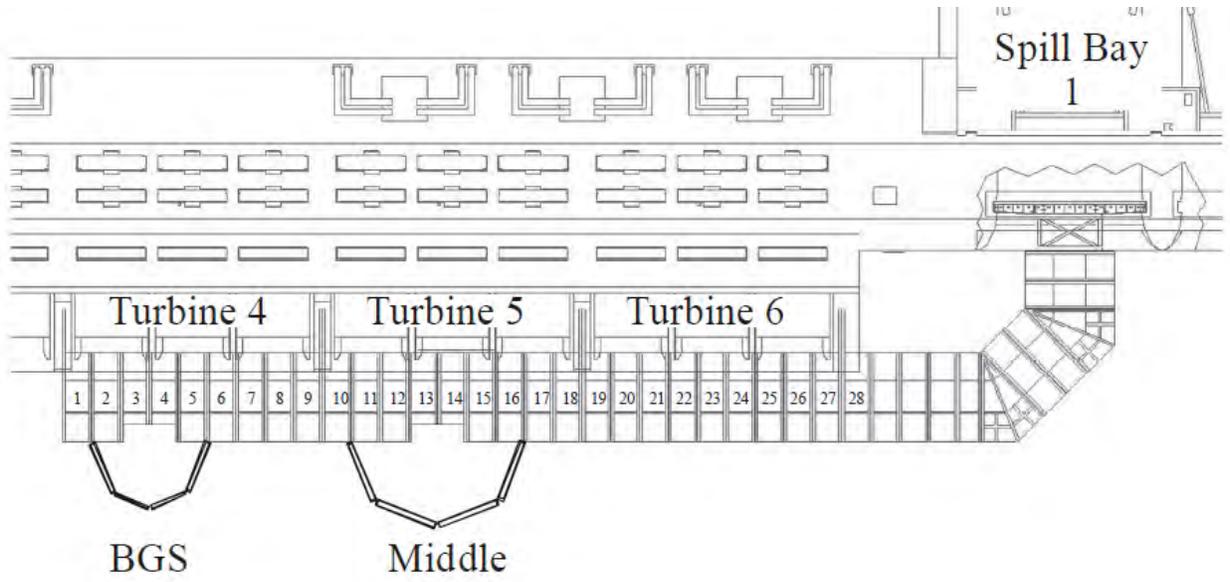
Plan View of Surface Bypass and Collector Upstream of Turbine Units 4–6 Showing Outfall Through Spillbay 1
